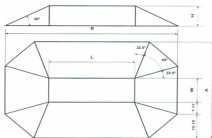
Typical Protection Structure Arrangement (Donis Engineering, 1999)
